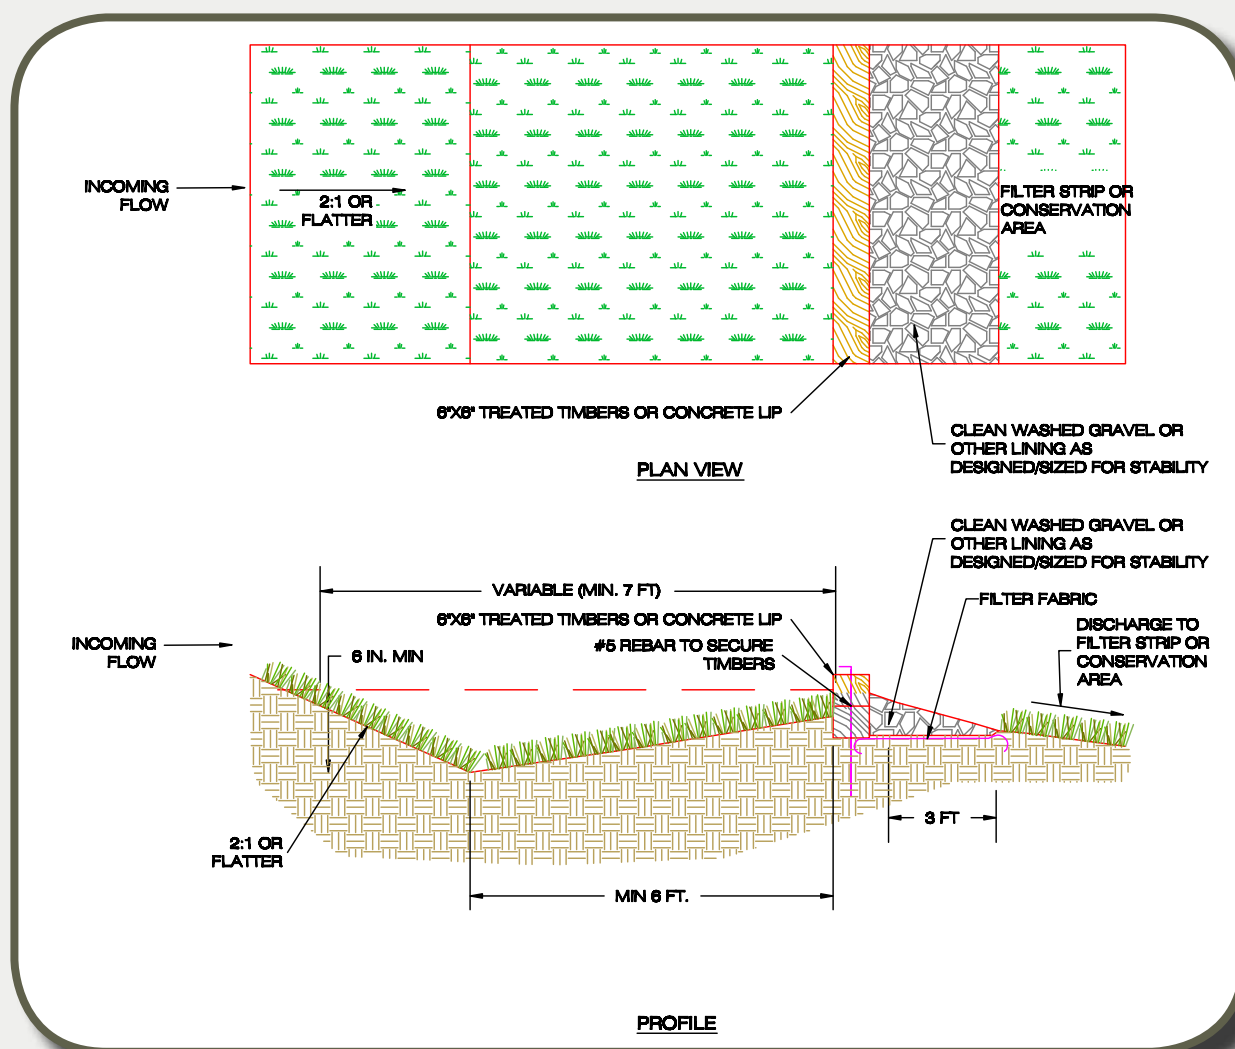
Channel Flow Level Spreader to Filter Strip or Conservation Area – Plan View and Section View
